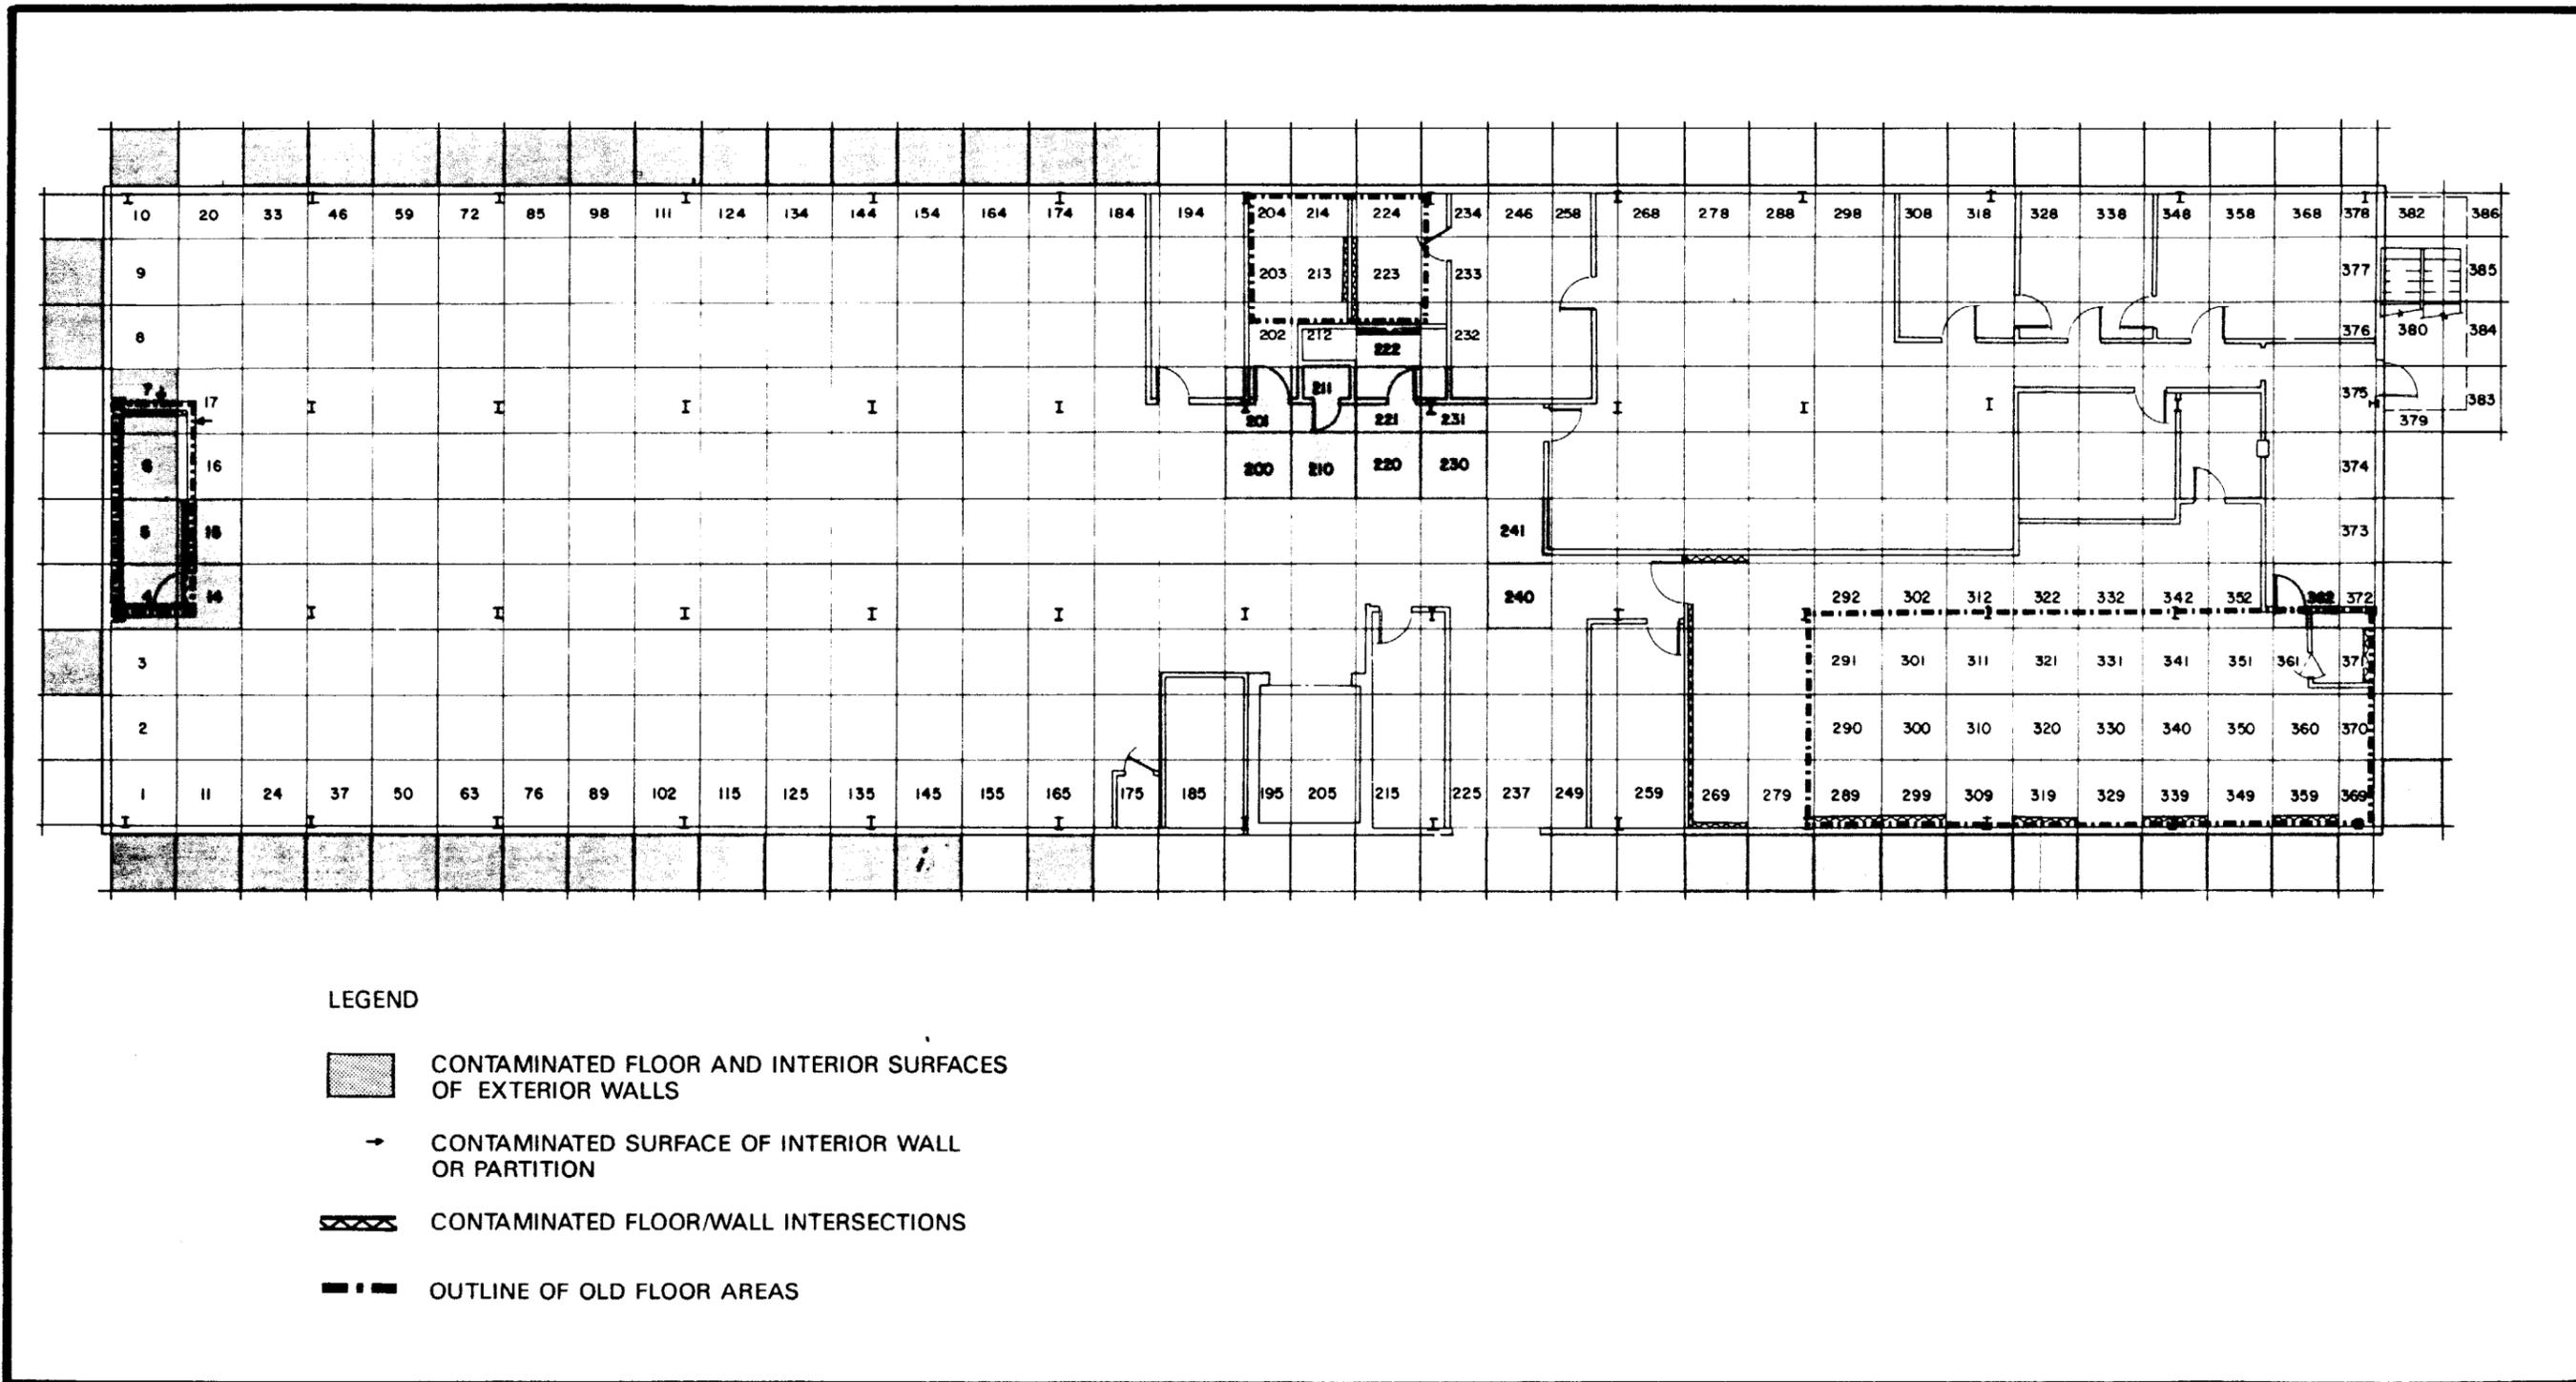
BUILDING 845, SECOND FLOOR: AREAS OF CONTAMINATION ON FLOOR, WALLS, AND FLOOR/WALL INTERSECTIONS
